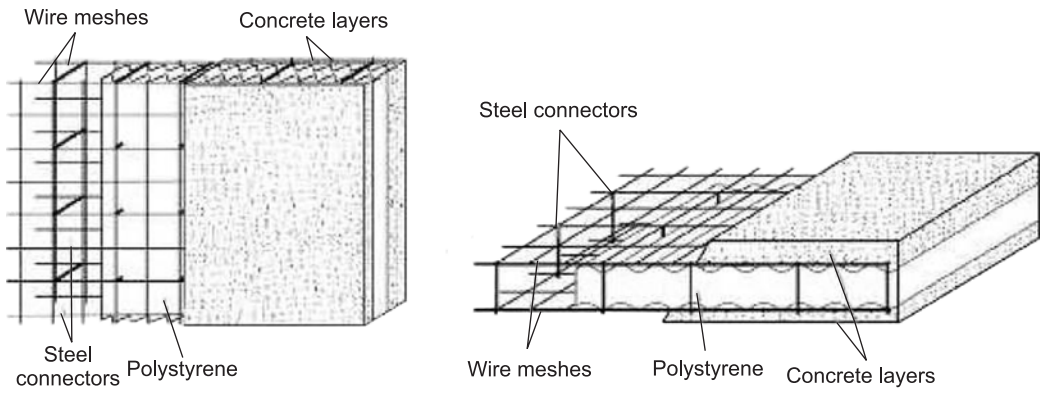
Schematic sketches of the components of wall and floor sandwich panels
